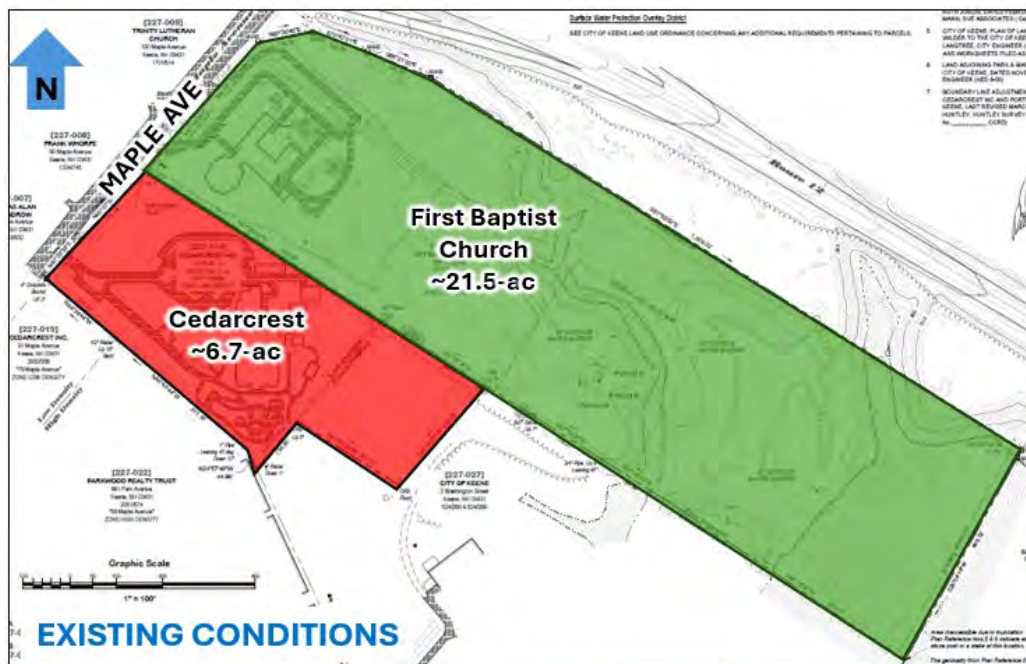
A snippet from the existing conditions plan showing the current layout of the Cedarcrest site at 91 Maple Ave & the First Baptist Church at 105 Maple Ave.
